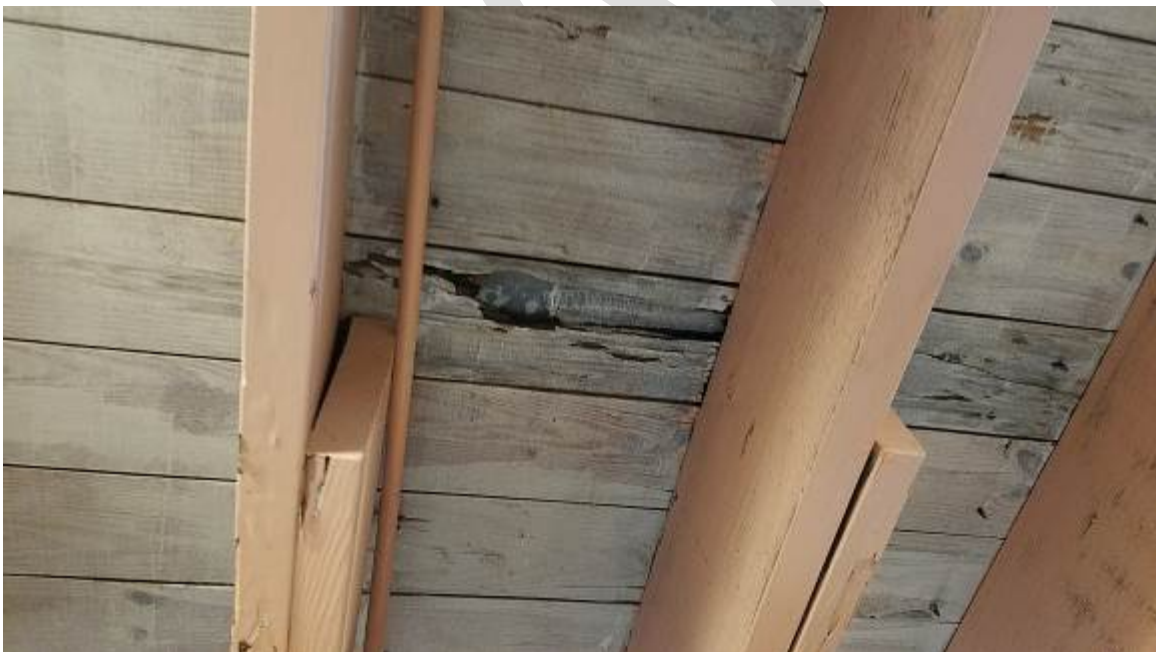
Roofing deck with hole demonstrating heavy termite damage to deck boards in some locations.
